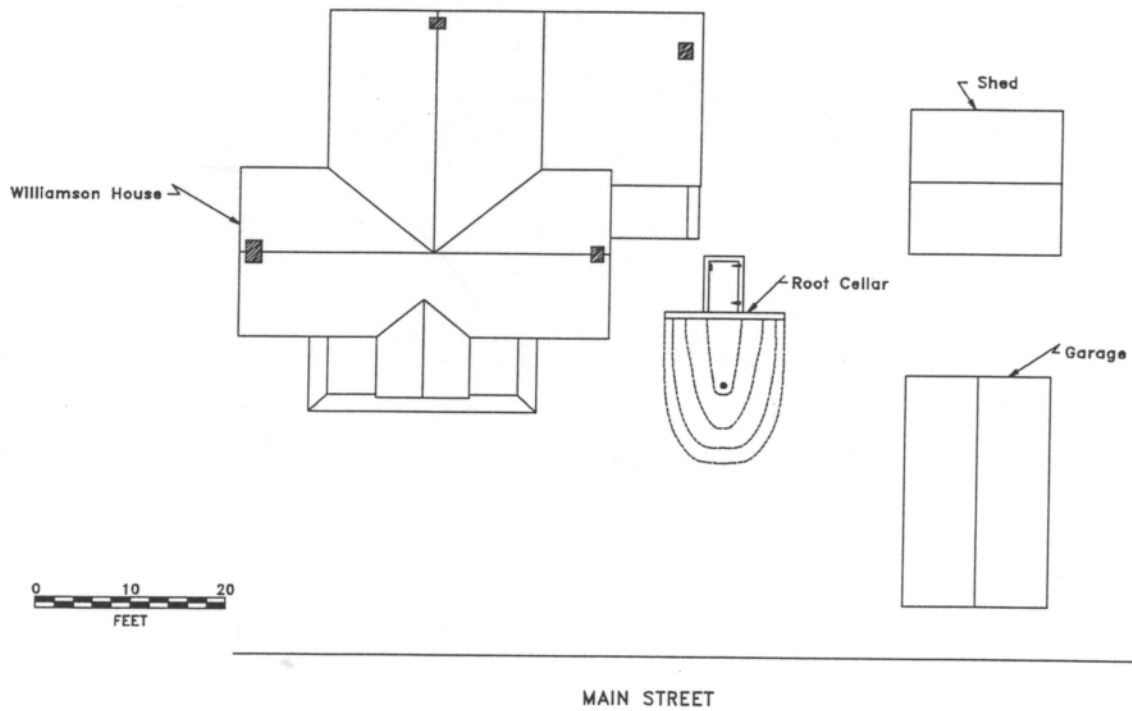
Site plan showing the Williamson House and surrounding outbuildings, 1995.
